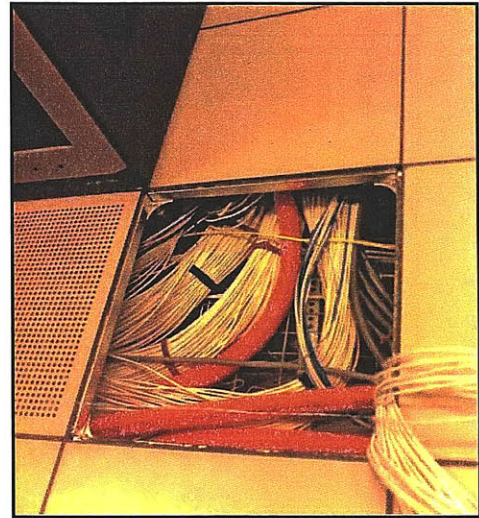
Network cabling acting as a raised floor obstruction¹⁰²
